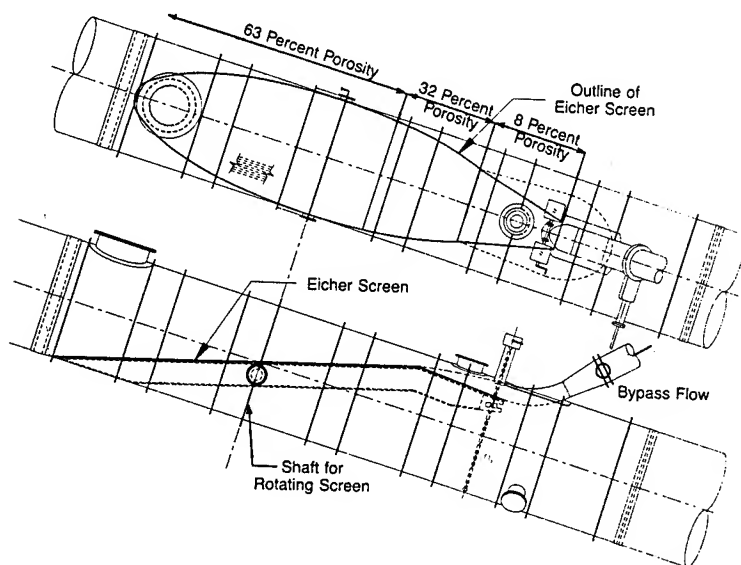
Plan and view sections of the Elwha Eicher Screen.
